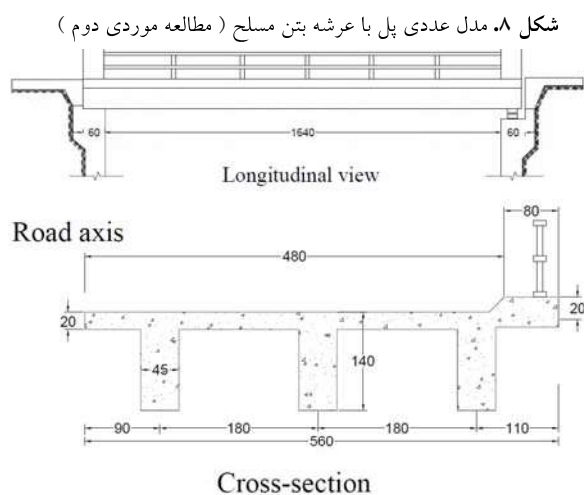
Numerical model of bridge with reinforced concrete deck (second case study)
